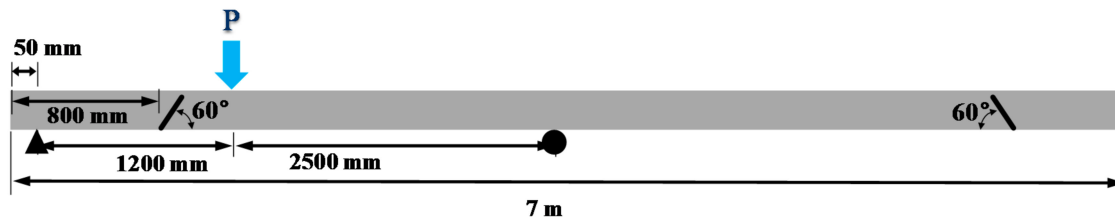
Details of the shear reinforcement (Units: mm and degree).
